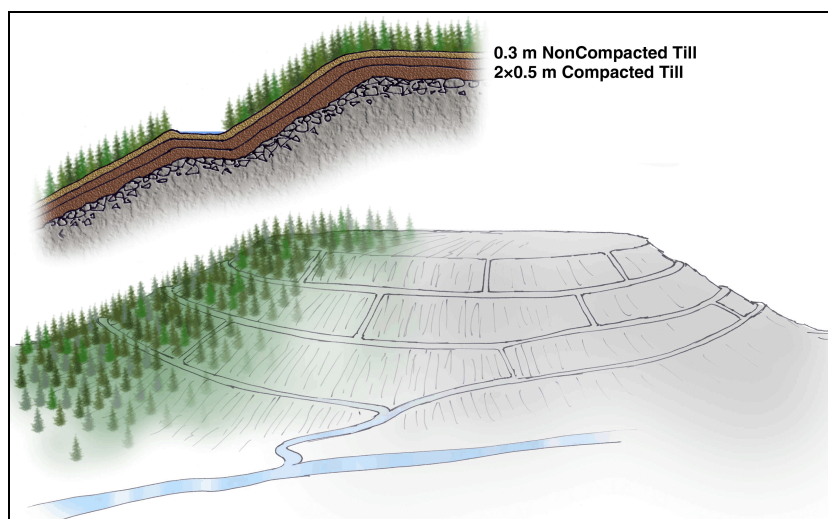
Structure of waste-rock dump cover and illustration of decommissioned waste-rock dump at Aitik site
